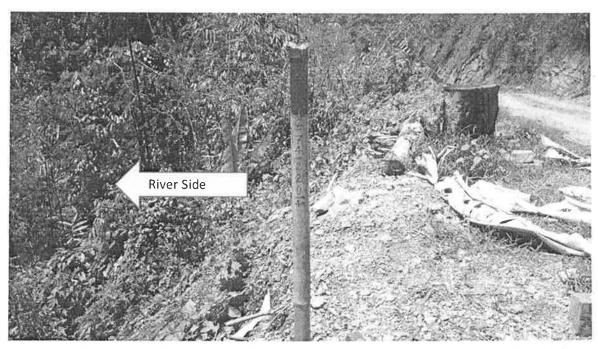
View (@ km 74+220) of project road alignment adjacent to Irang River Bank
